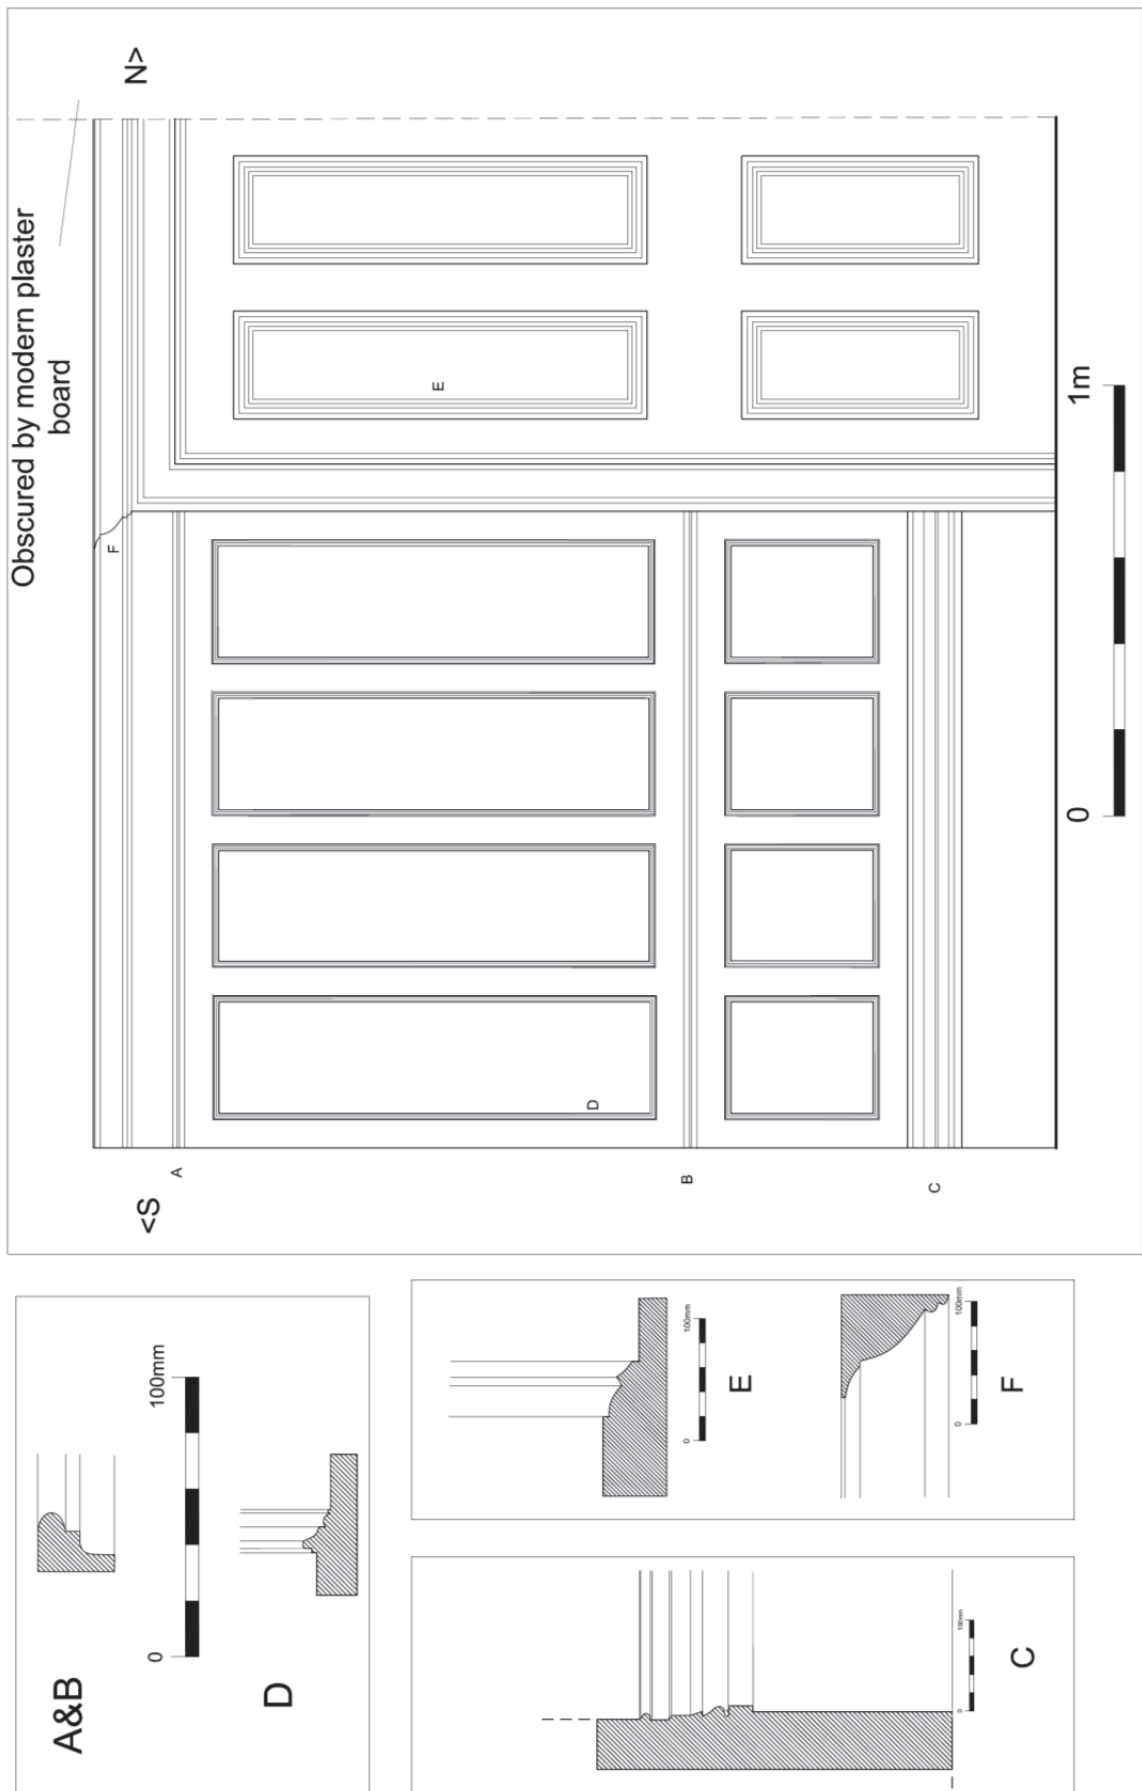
Drawing showing details of the panelling and moulding in room G1, south west corner
